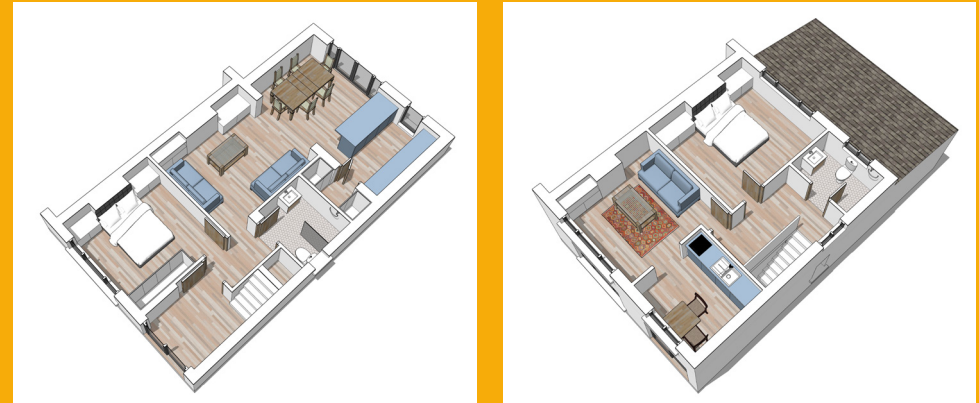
3D model of the Ava Housing indicative strategy: Modified ground floor and first floor with additions and modifications.
